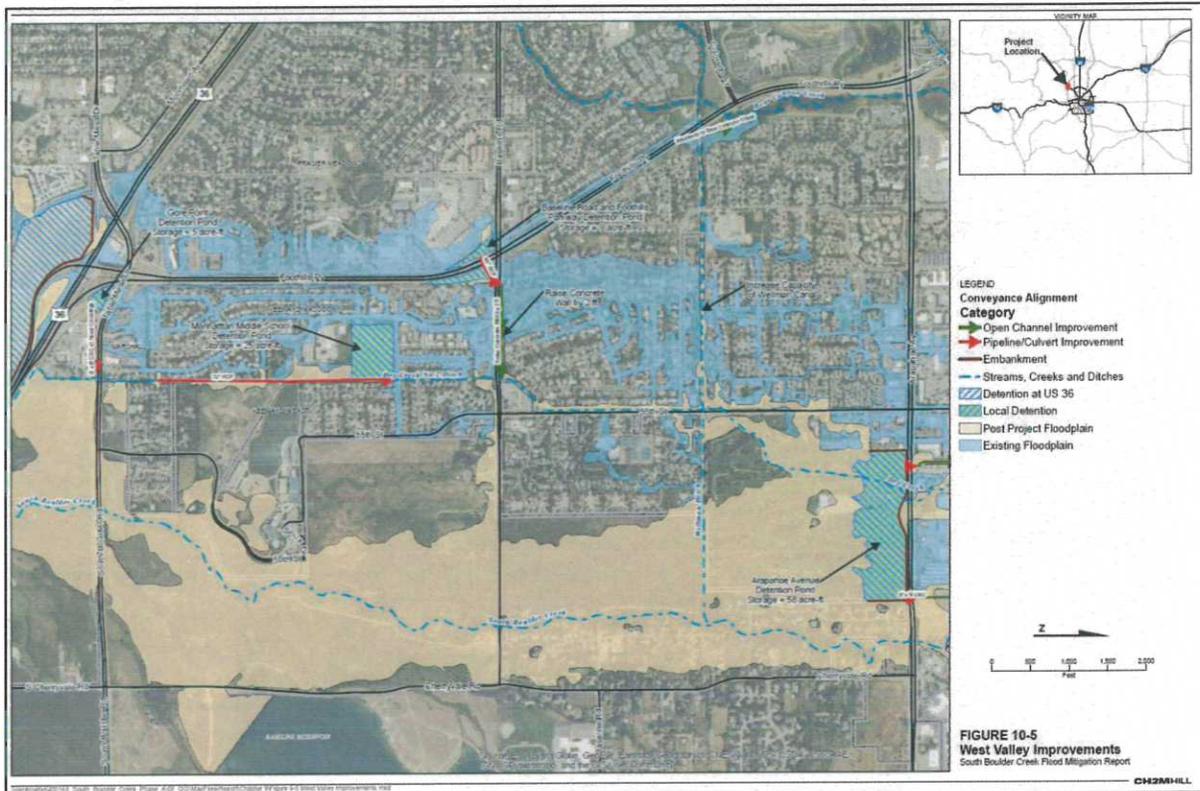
Flood Mitigation Plan West Valley Improvements Plan View
